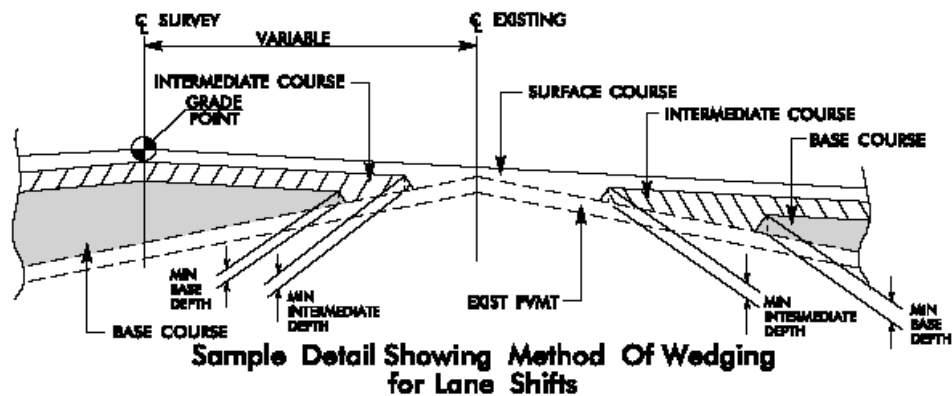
(Non-Symmetrical Widening) Grade Point Shift
